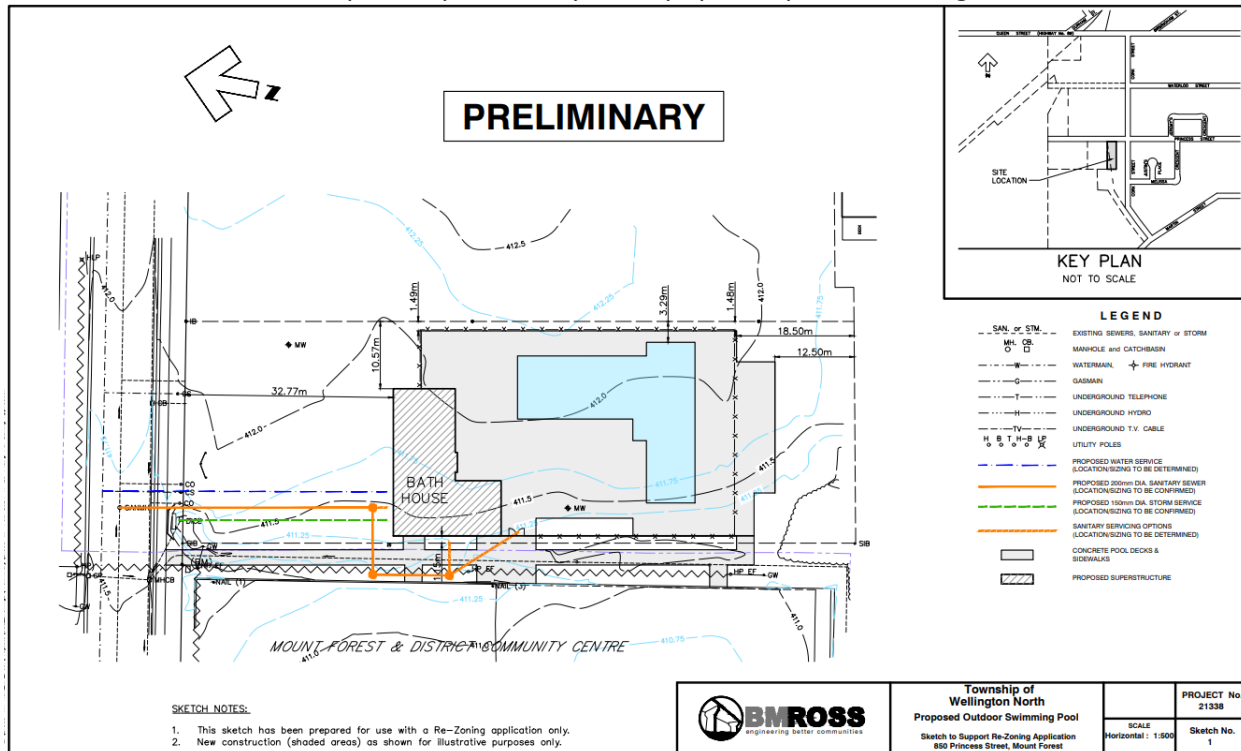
Site Plan sketch submitted by BMROSS., December 2024
